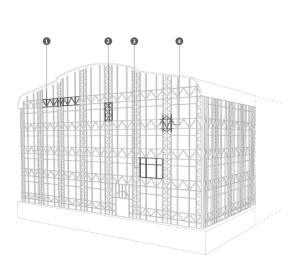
Structural components of the Hucke factory facade. 1) lattice beam 2) structural panel 3) span reinforcements 4) meeting of lattice beam with structural panel (drawing by Katherine Cabezas)
